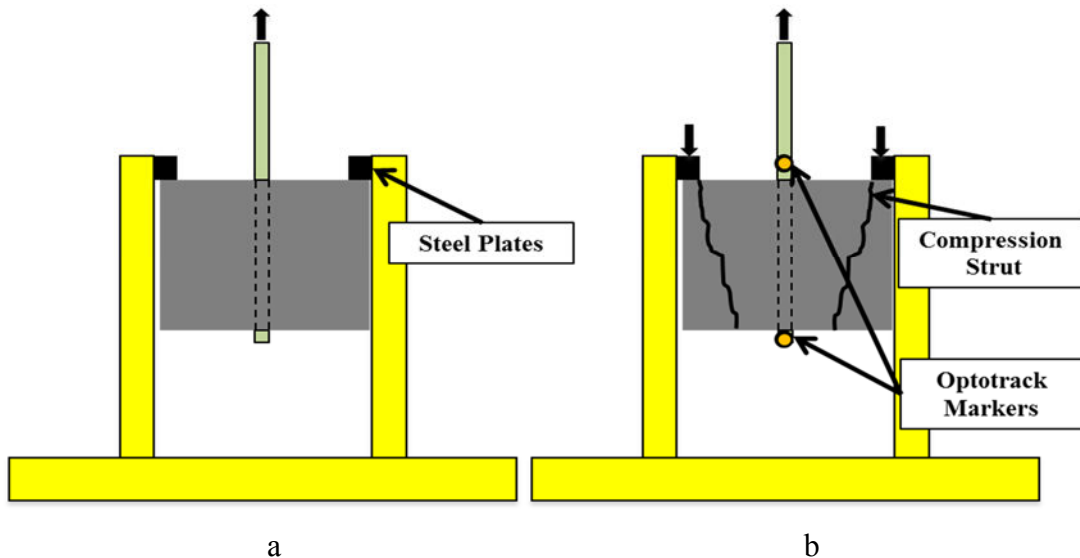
(a) Test Set Up for Bar Pull Out (b) and Instrumentation and Load Path for Specimen
